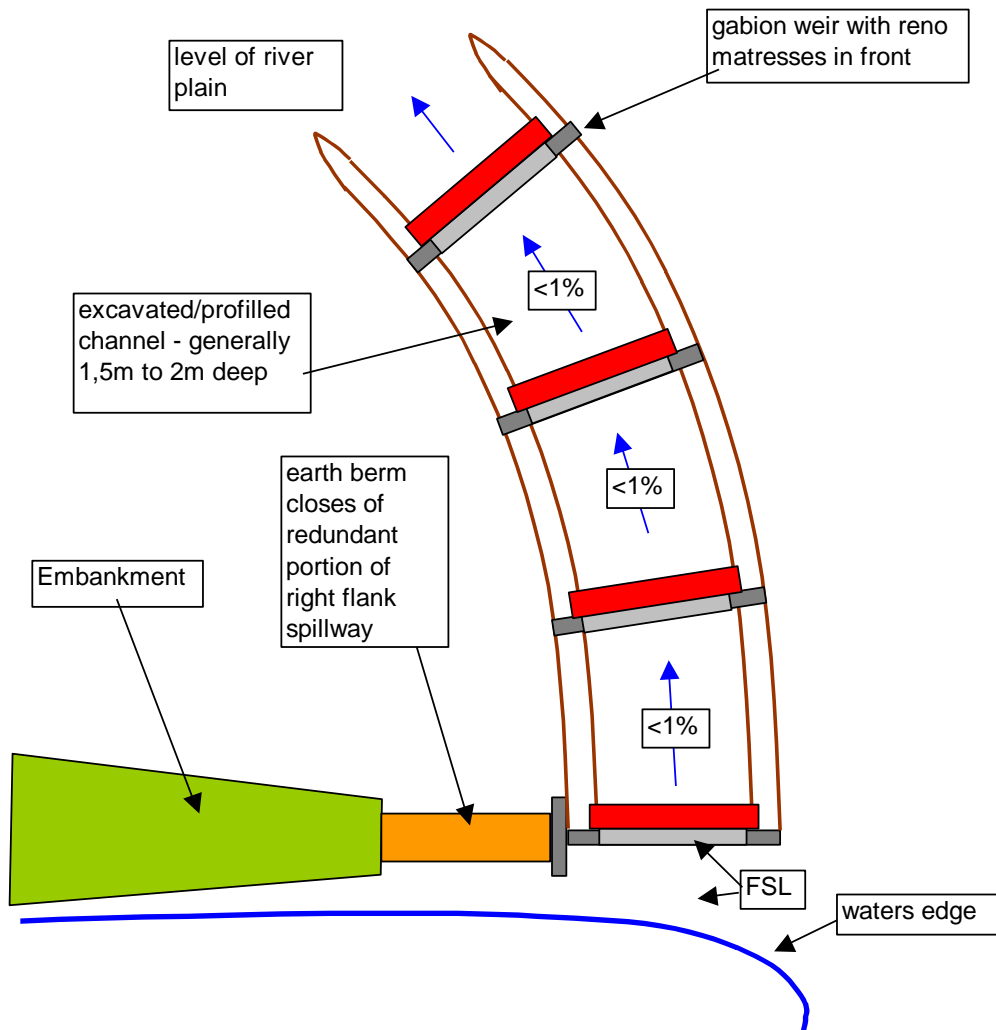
(b) – Plan view of spillway, showing the four gabion structures constructed across the excavated/profiled channel at strategic positions
